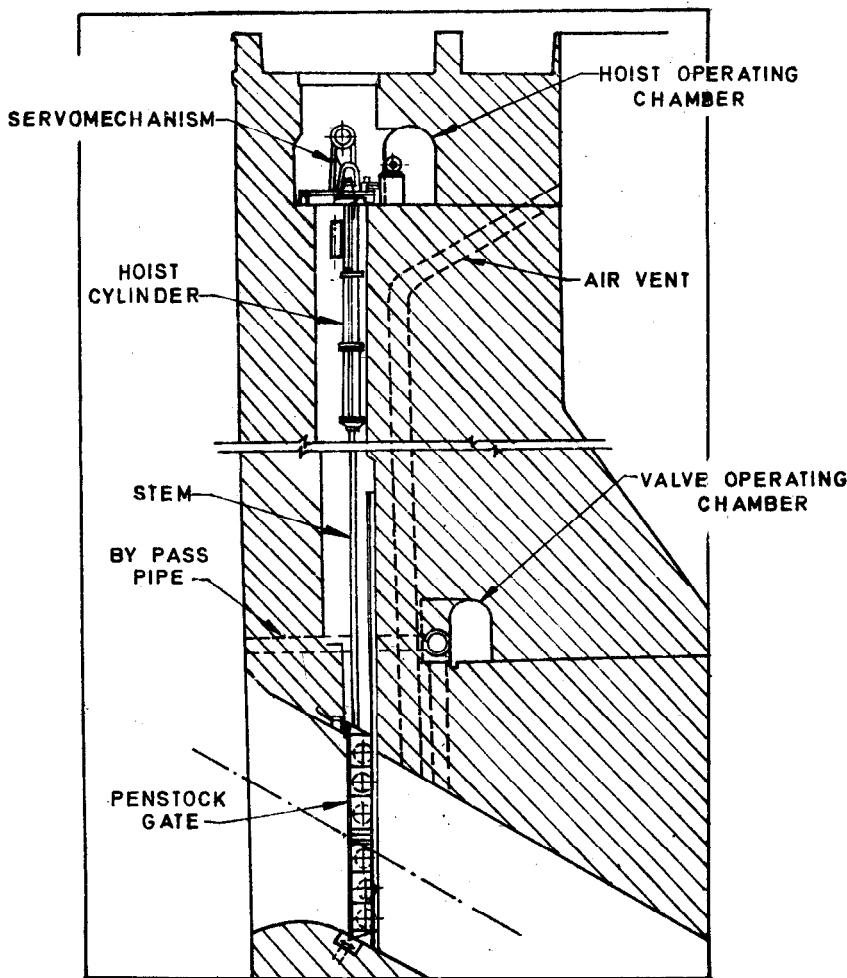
TYPICAL ARRANGEMENT OF HYDRAULIC HOIST FOR PENSTOCK GATE
